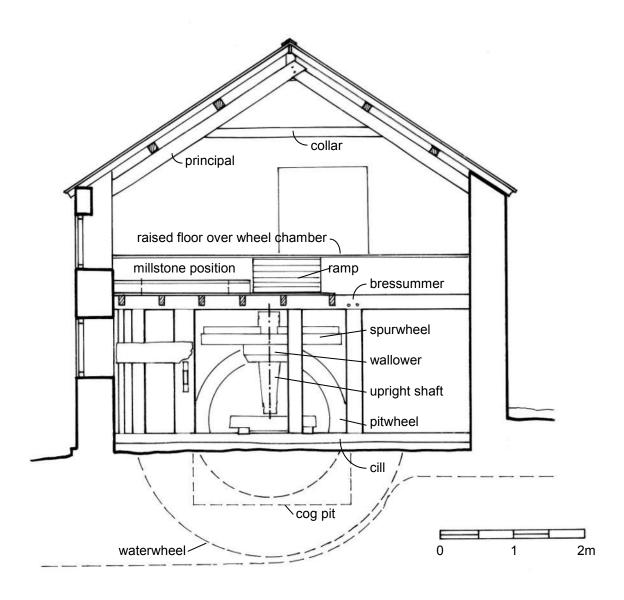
West – east section through south mill, looking at hurst face with machinery shown in outline
